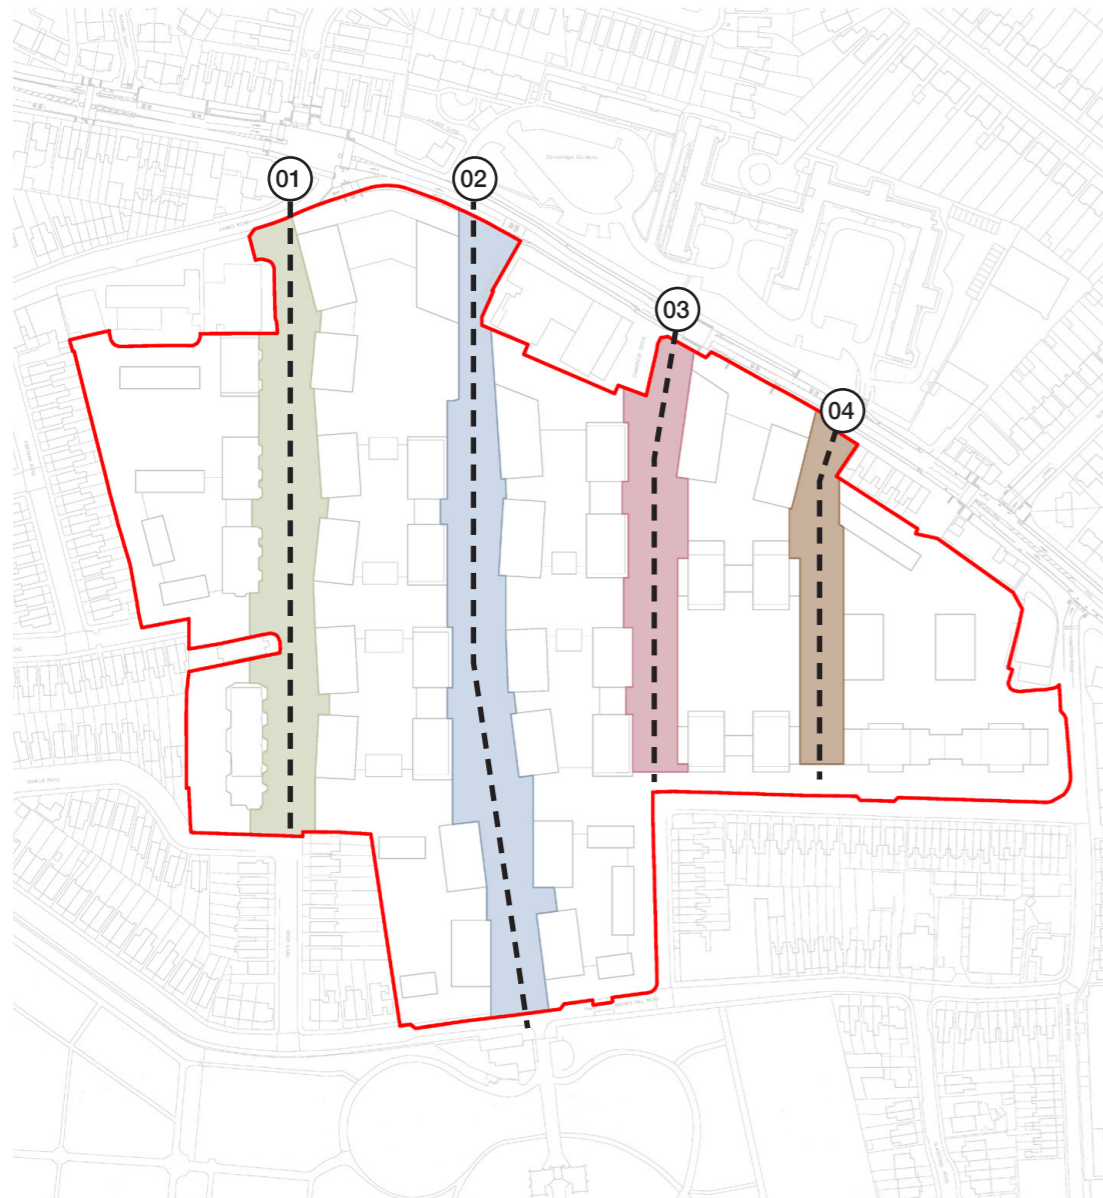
Four key spaces: Washington:Piper (01 - Washington Avenue and Piper Way), Madingley:Willingham (02 - Madingley Avenue and Willingham Way), Croxton Avenue (03) & Stapleford Way (04) - Plan diagram
